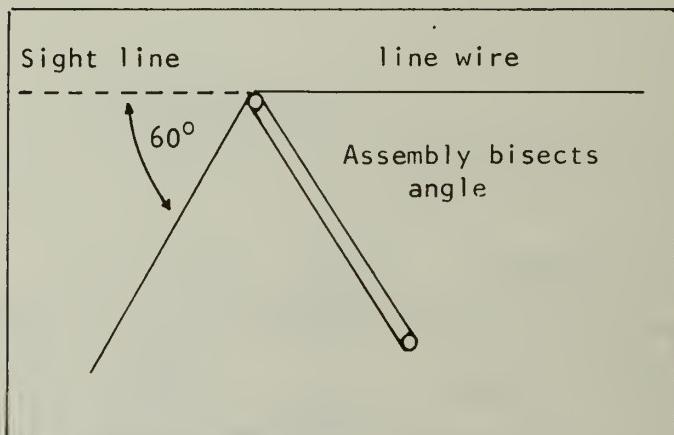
Medium Corner Brace Assembly for Change of Direction Greater than 20° but Less than 60°
